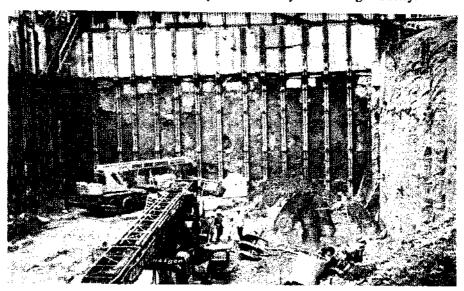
TIED-BACK BASEMENT CONSTRUCTION, JOHANNESBURG
